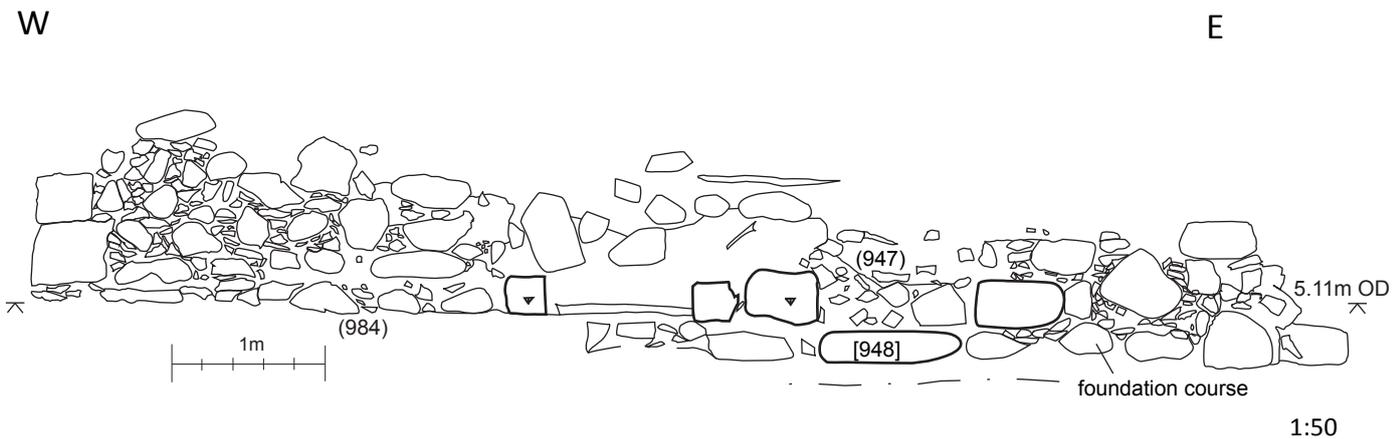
v. South facing elevation of external face of wall [904] showing doorways and position of mason's marks <sup>12</sup>
